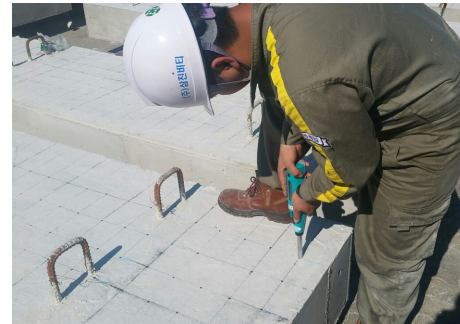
Rebound hammer test in a grid on the concrete slab surface.
